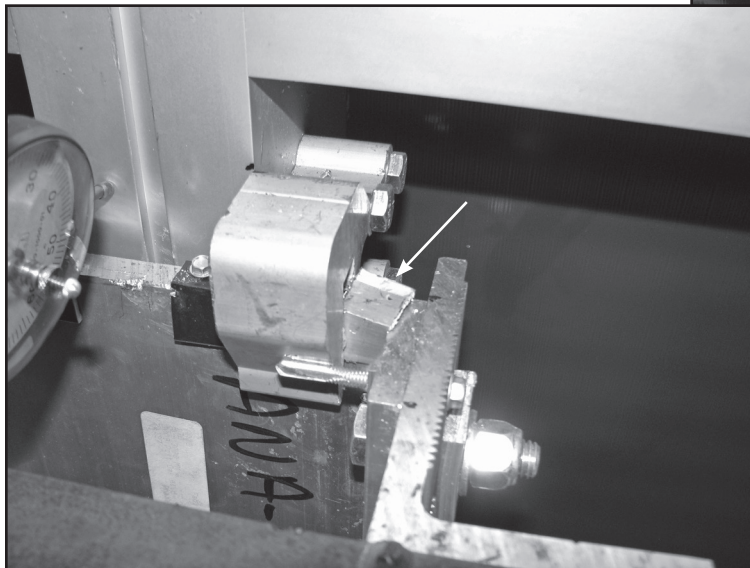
Shim added at unitized curtain wall anchor bracket assembly.
